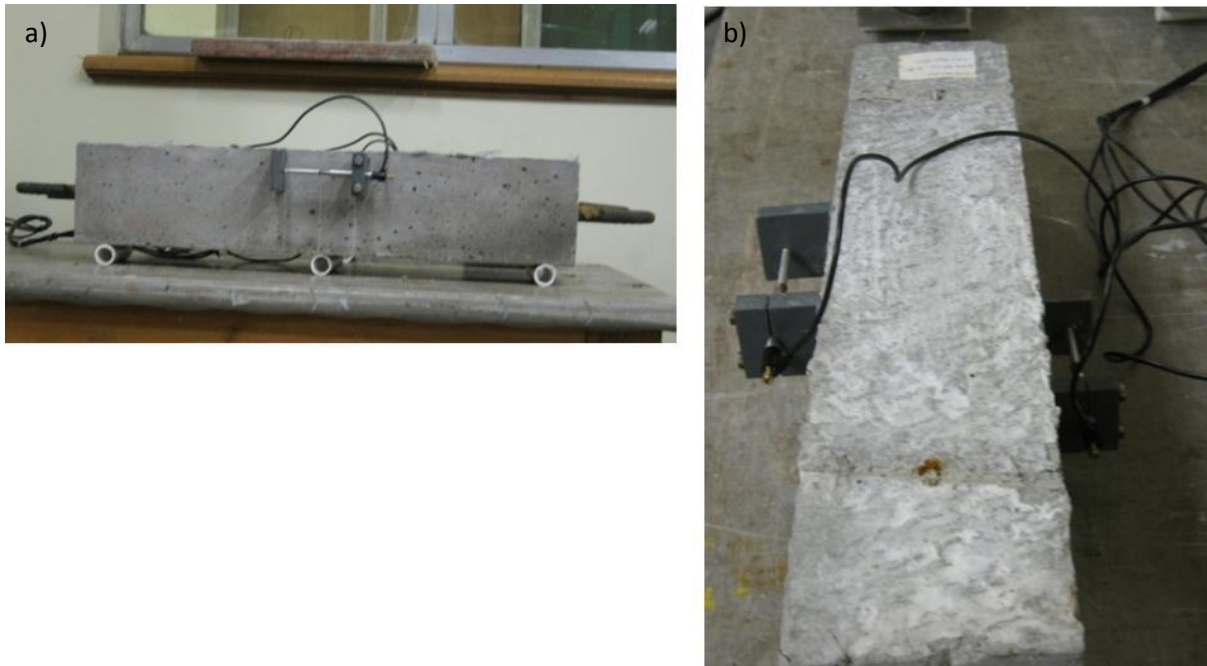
The Shrinkage Beams were a) supported by PVC tubes and b) fitted with Perspex blocks.
